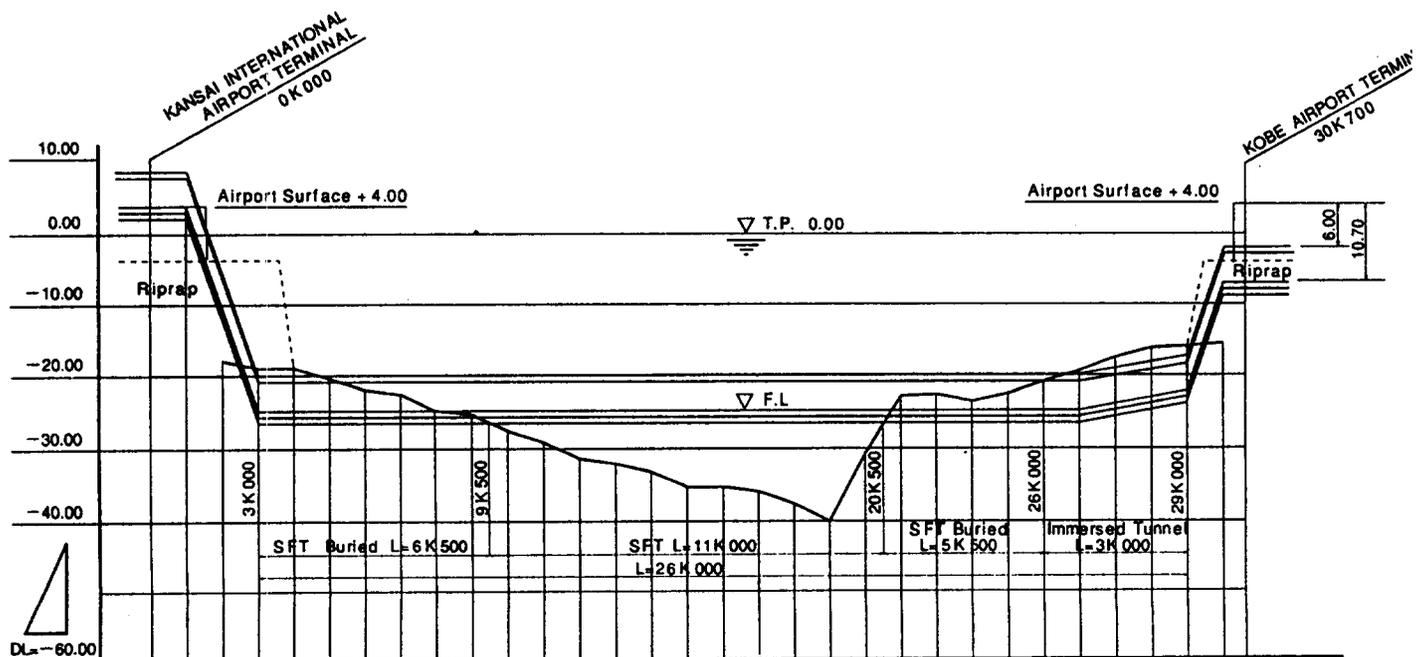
Vertical section of the route for a proposed SFT across Osaka Bay, connecting Kansai International Airport and Kobe Airport.
